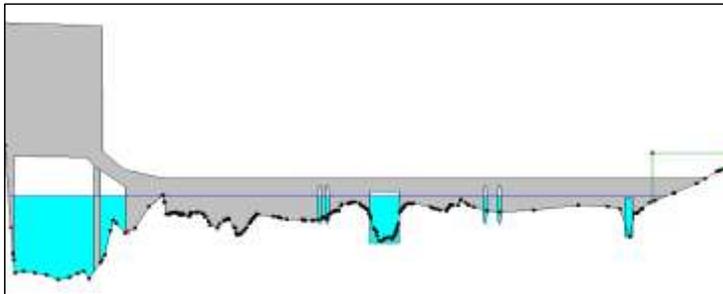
Proposed raised road with additional floodplain conveyance under road
